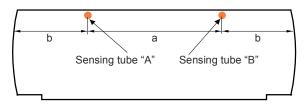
Tunnels with flat ceiling, over 3 traffic lanes
